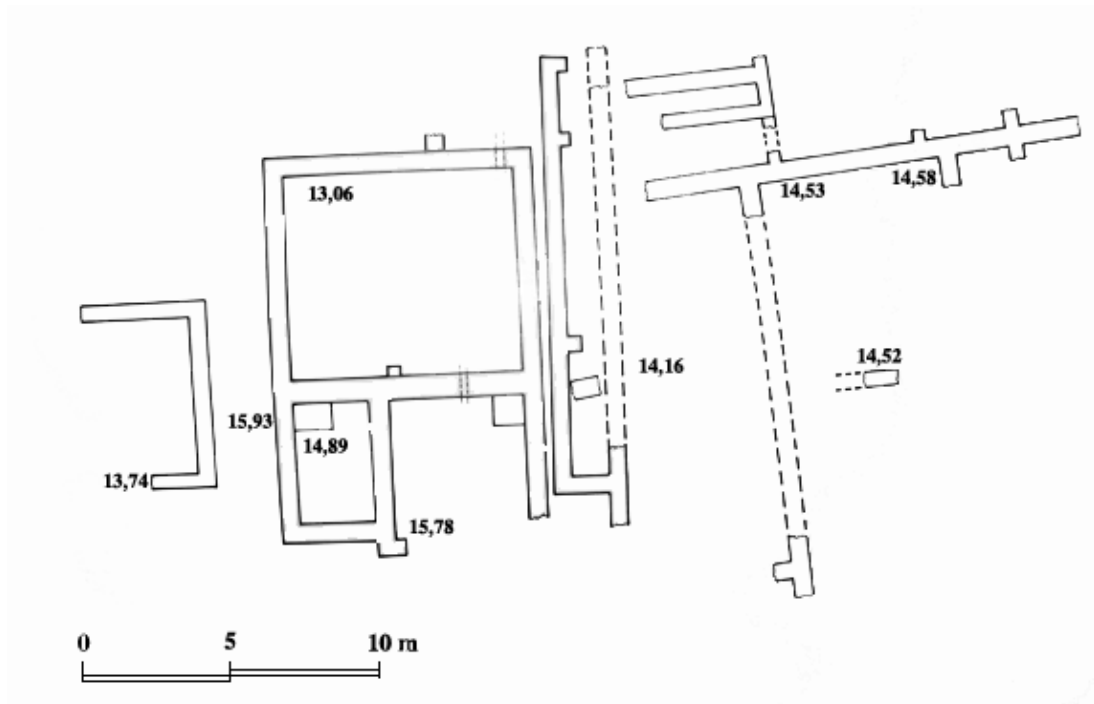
Buildings in the foundations for Dunav block of flats B 2 at Seres str.
